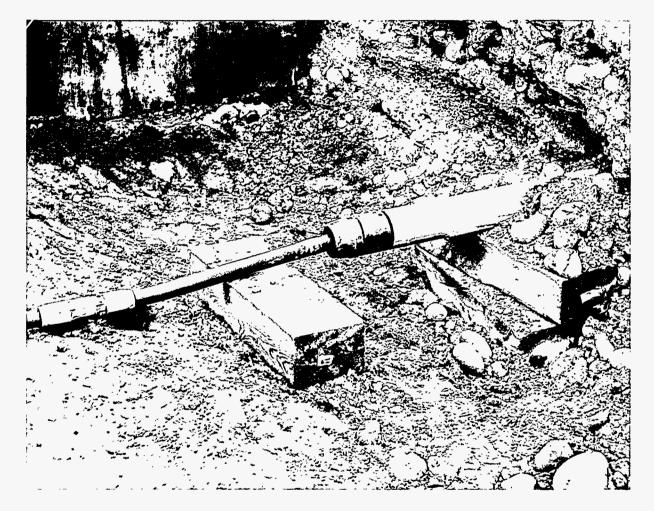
Pierce-Airrow penetrating Hanford test site geology.
